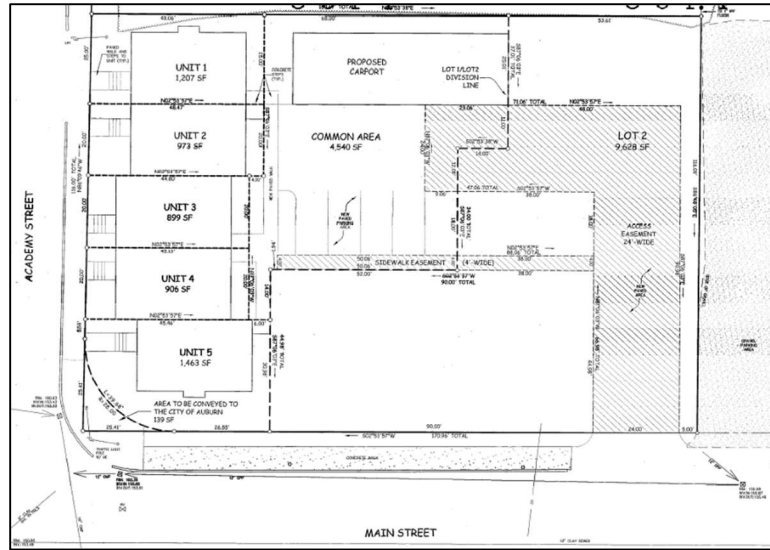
Proposed Subdivision Plan (ACRD, Book 49, Page 94)
